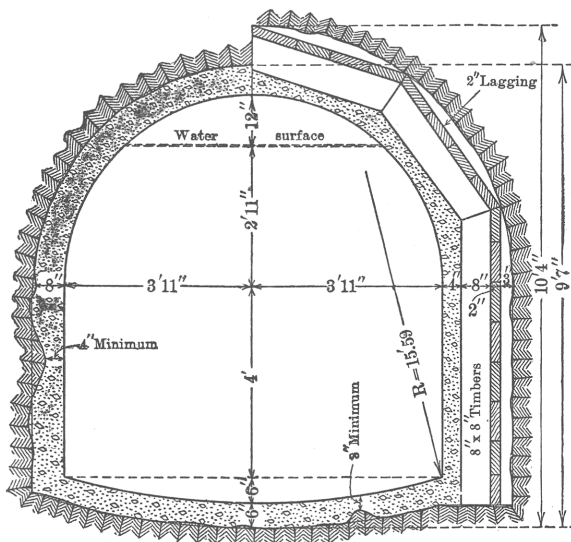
Cross section of a typical tunnel, Los Angeles Aqueduct.
